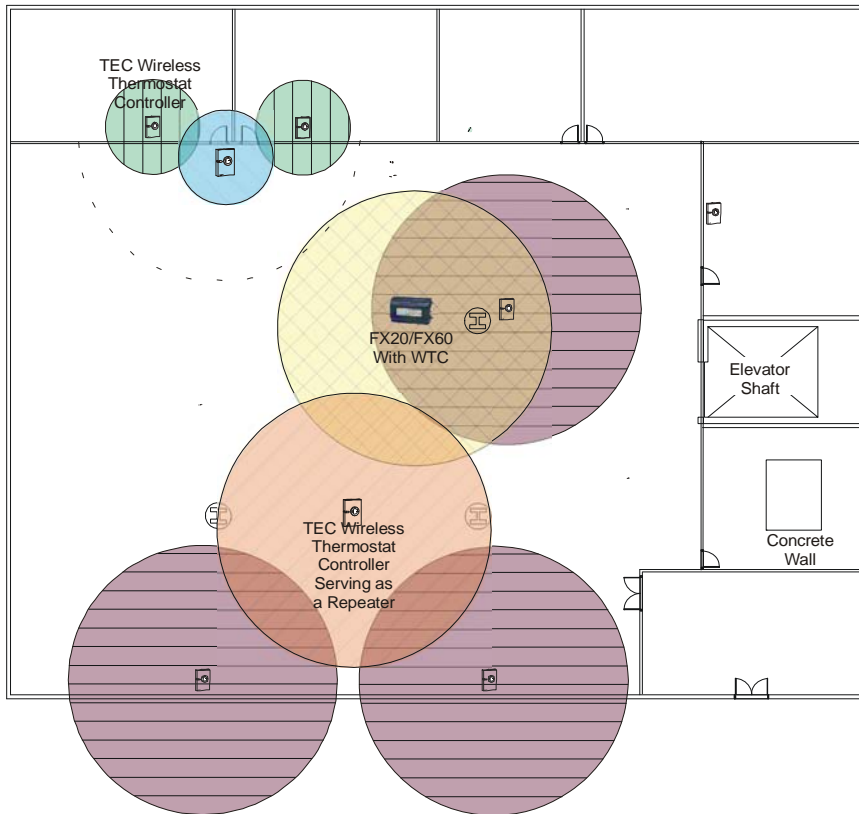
Building Floor Plan with TEC Series Wireless Thermostat Controller System, including Repeaters
